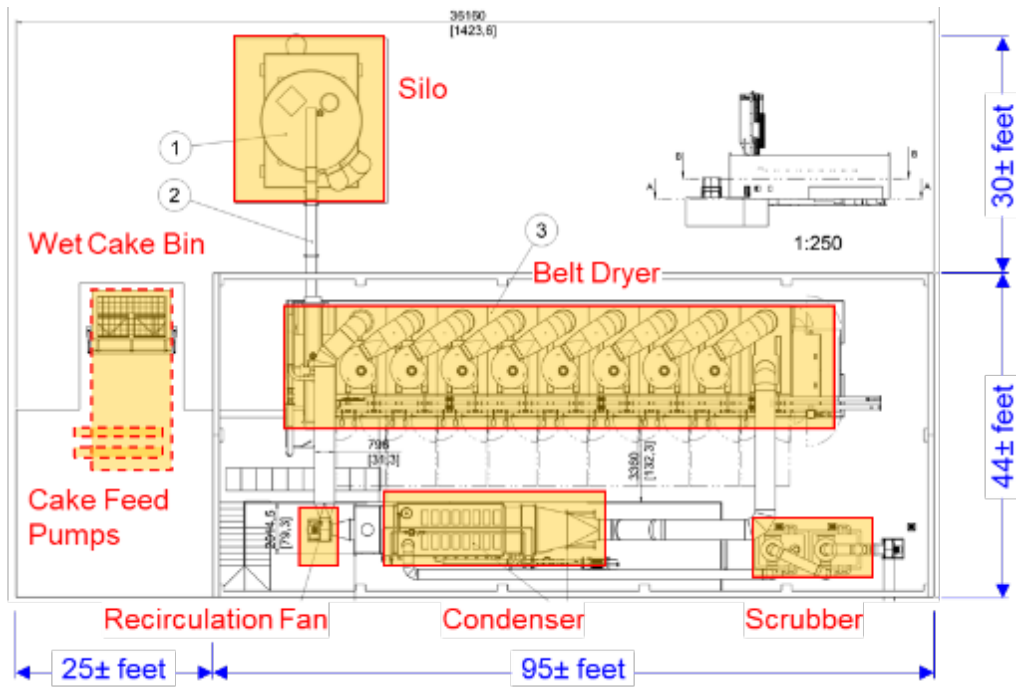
Drying Facility Conceptual Layout: Plan View (Source: Huber)
